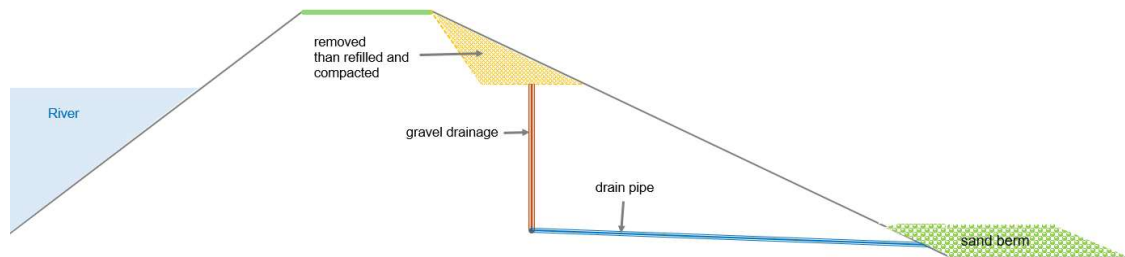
Schematic cross section of reinforcement containing vertical gravel drainage
